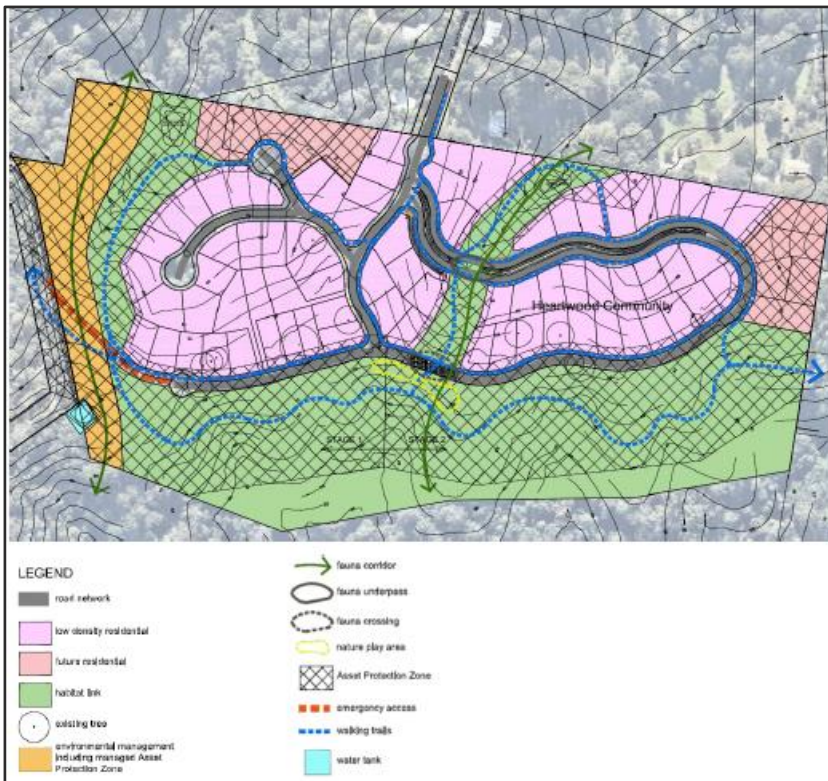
Concept subdivision of E4 portion of subject land (source: Planning Proposal)
